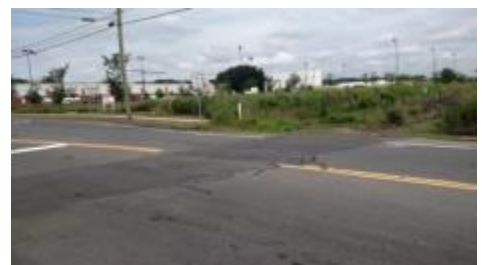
Gap in Sidewalk on North Side of Spring Street at Rail Trail Crossing Location
